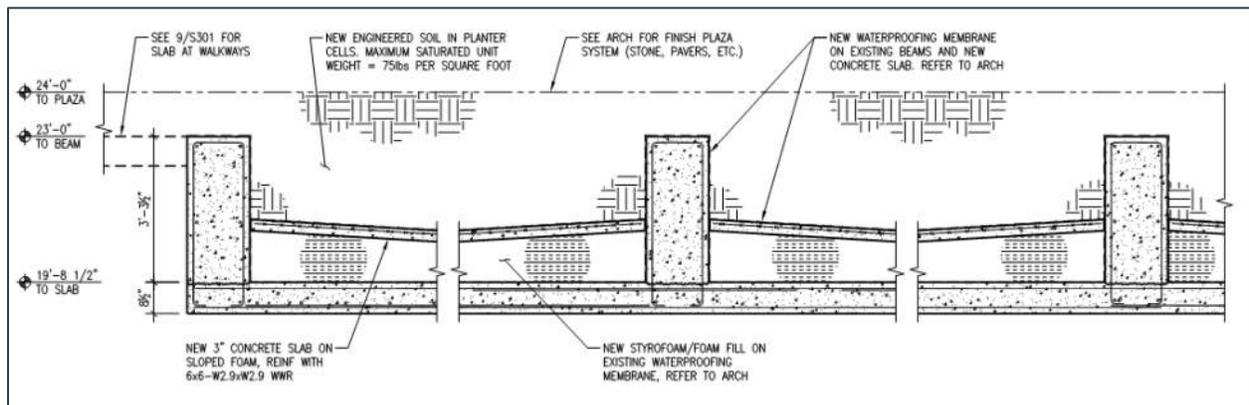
Detail showing topping slab on foam fill installed in abandoned planter cells during 2008 renovation
